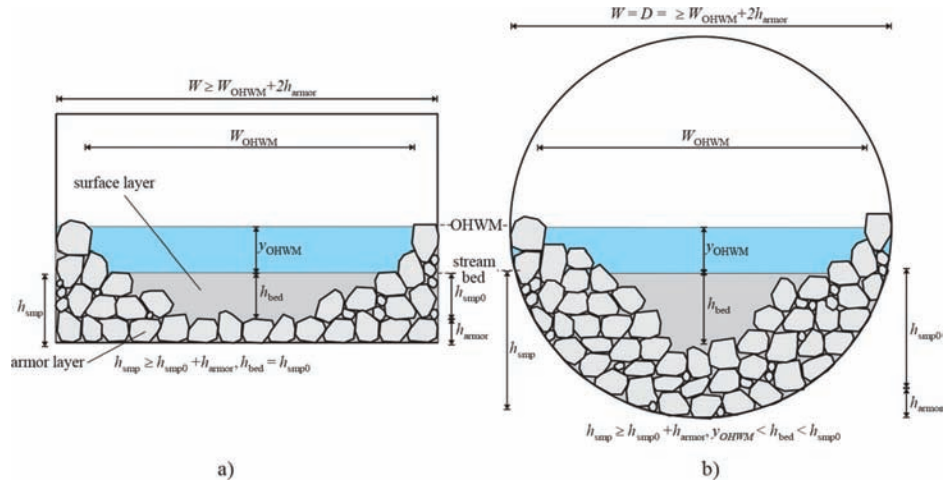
Proposed AOP culvert design choices for span and sump depth for (a) box culvert and (b) circular culvert.
